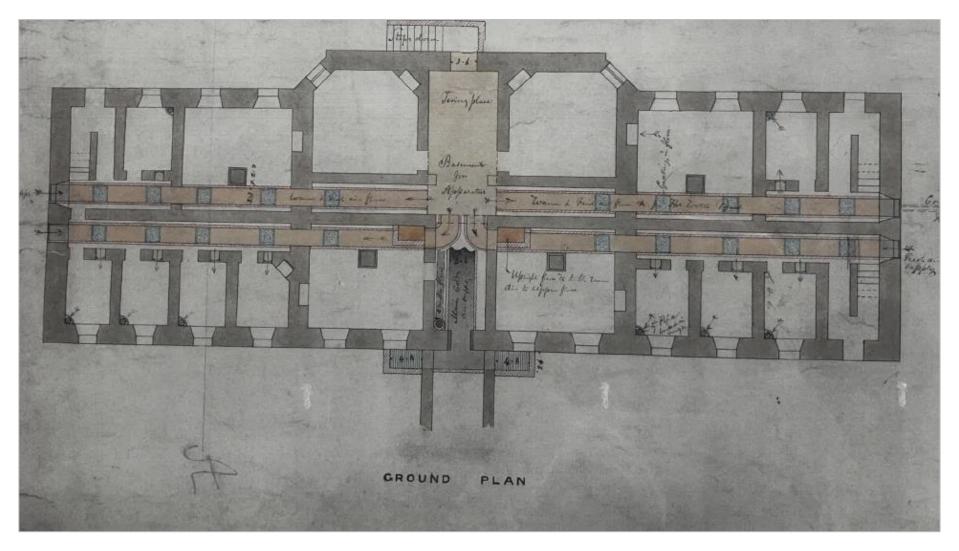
Plan showing the proposed alterations to the gaol building for the Haverfordwest Police. Pipes are depicted in the south-west corners of several former cells on the south side of the building. Heating flues are shown along the centre of the building, along with a firing place in the basement (centre north). Plan ©County Record Office.
